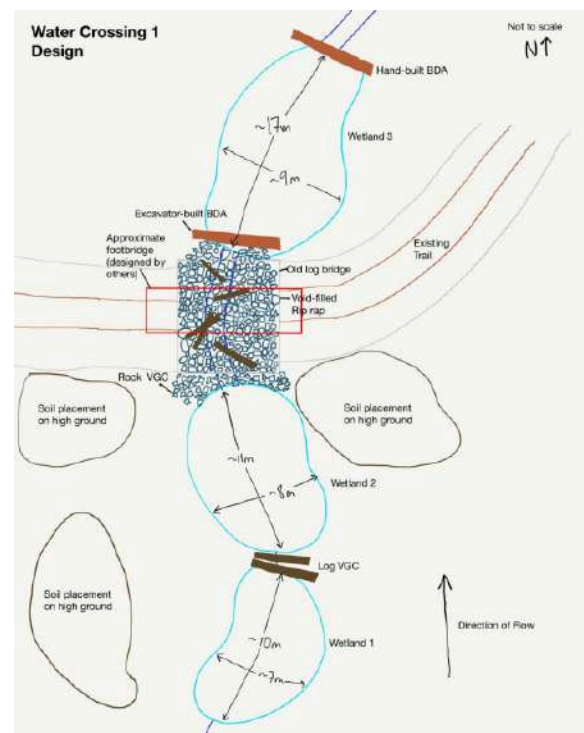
Restoration design for Crossing #1 (Rewilding Water & Earth)
